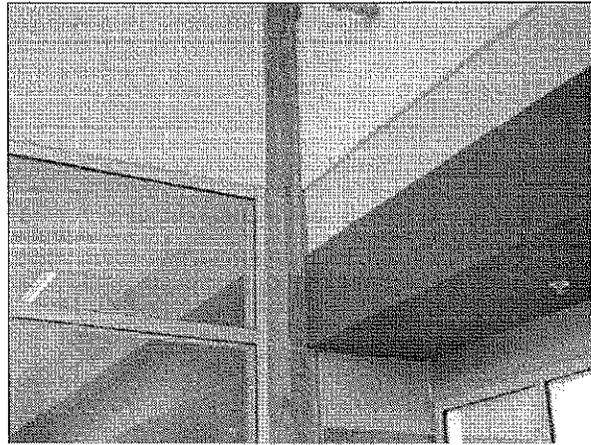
Infrared showing air leakage at wall to column/joist/ceiling interface
